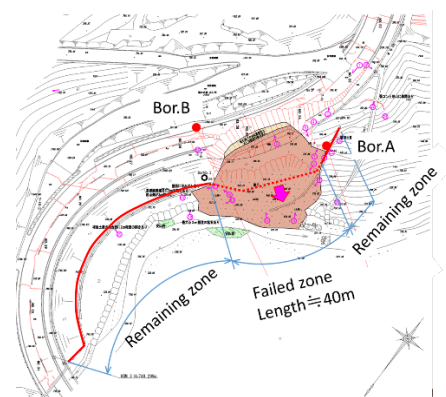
Plan view of failed and non-failed reinforced soil wall
